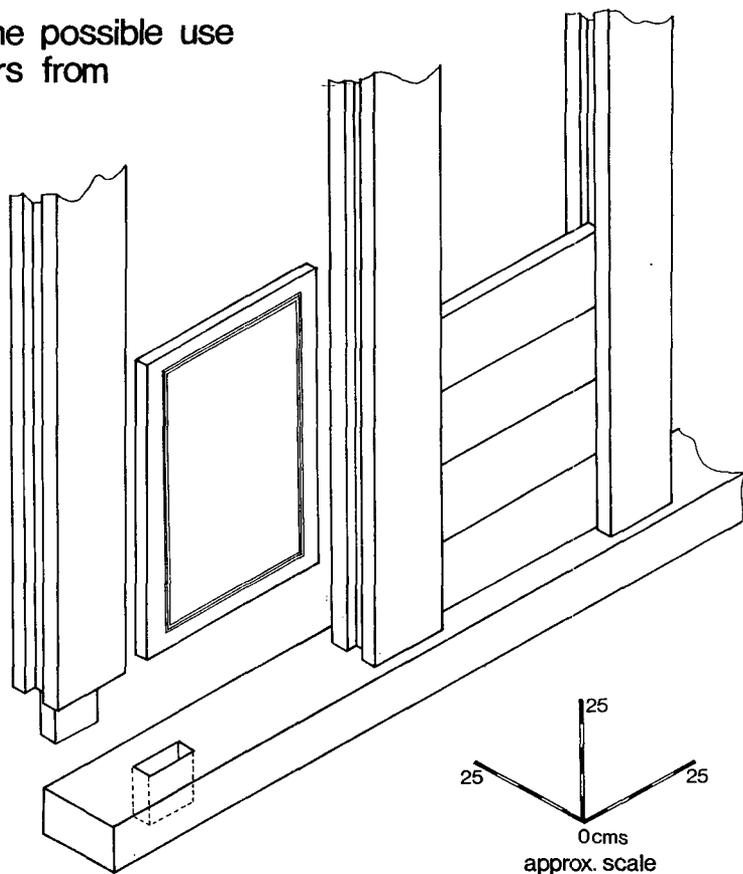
Reconstruction of the types of walling possible using the structural timbers recovered from Ditch 1
